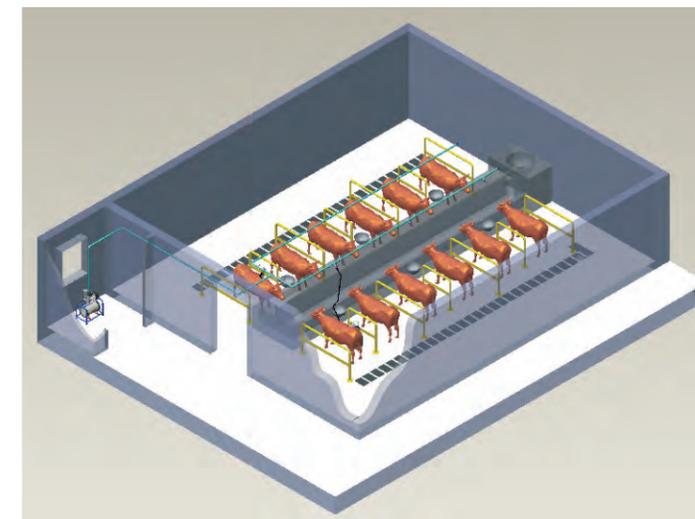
(C) Milking Machine Installation Schematic in cow shed-isometric view
